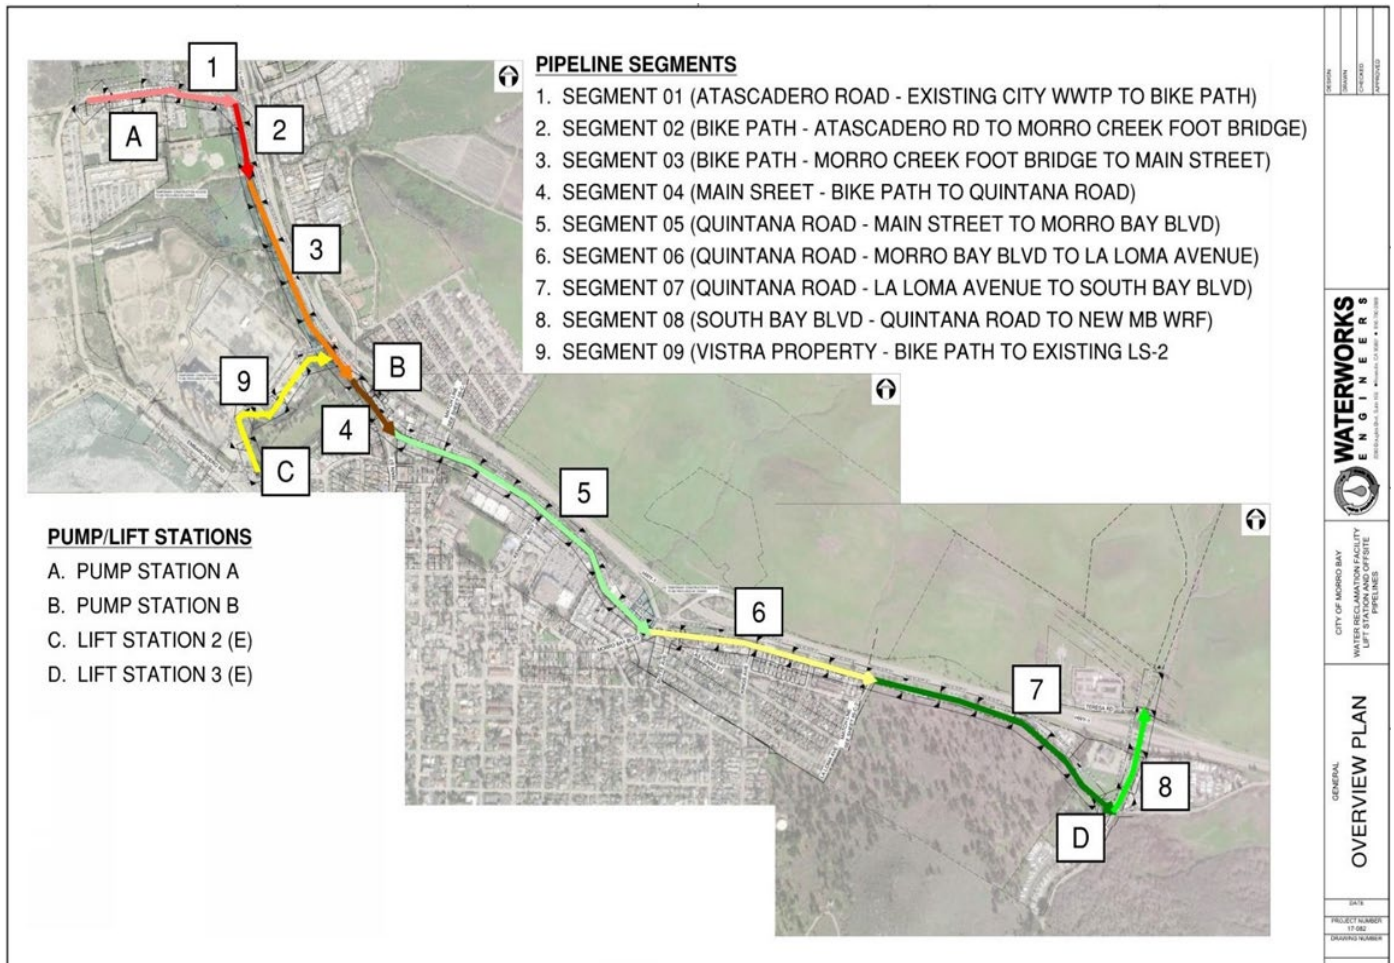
Morro Bay Conveyance Facilities Overview Plan
